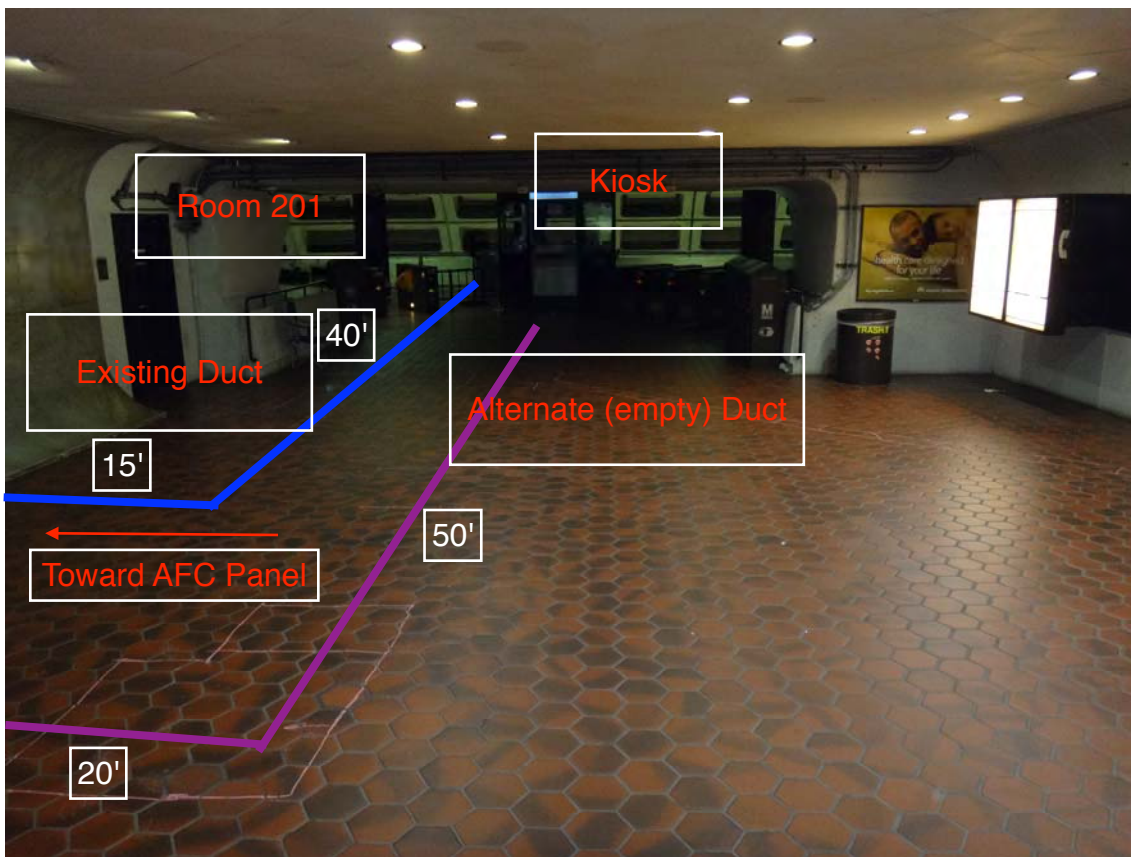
Existing and alternate duct layout on mezzanine floor
